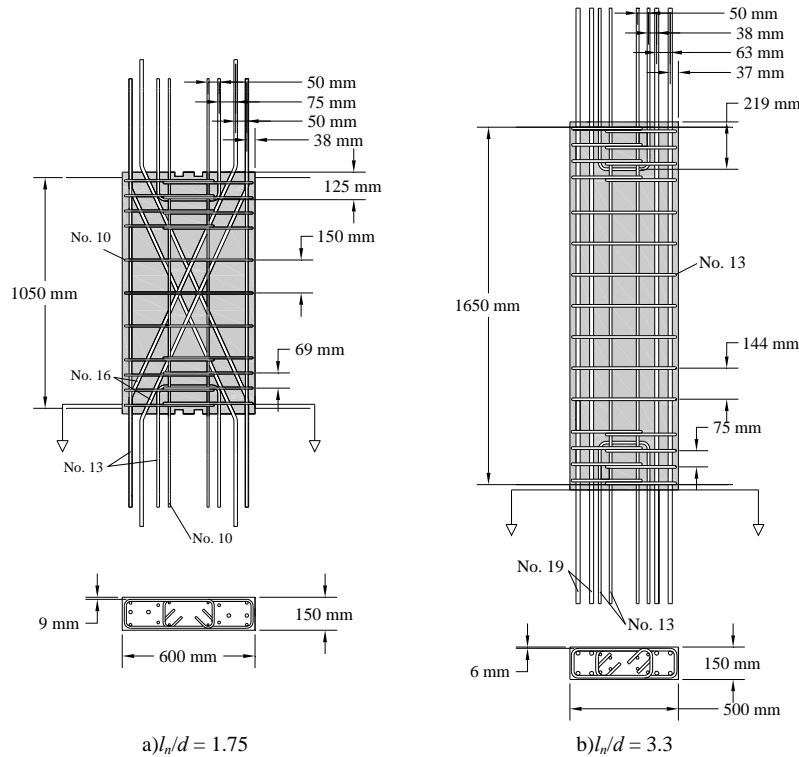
Reinforcement detailing for "short" and "slender" HPFRC coupling beam specimens
